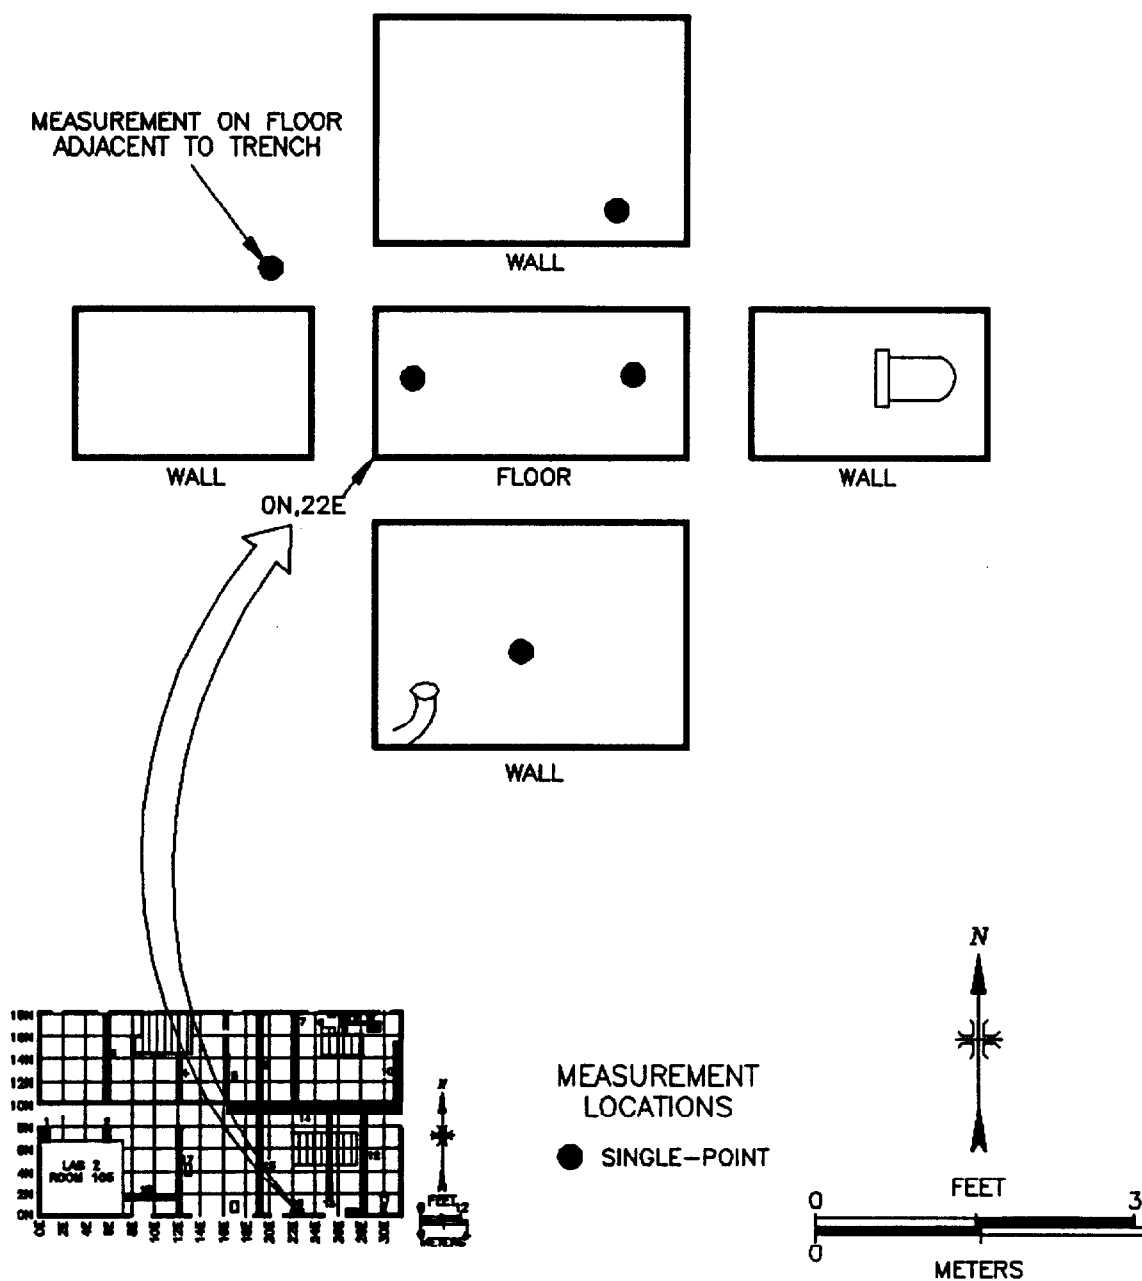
Building 23, Lab 1, Trench #16 (Sump) on South Wall Between Rooms 112 and 113 – Measurement Locations
